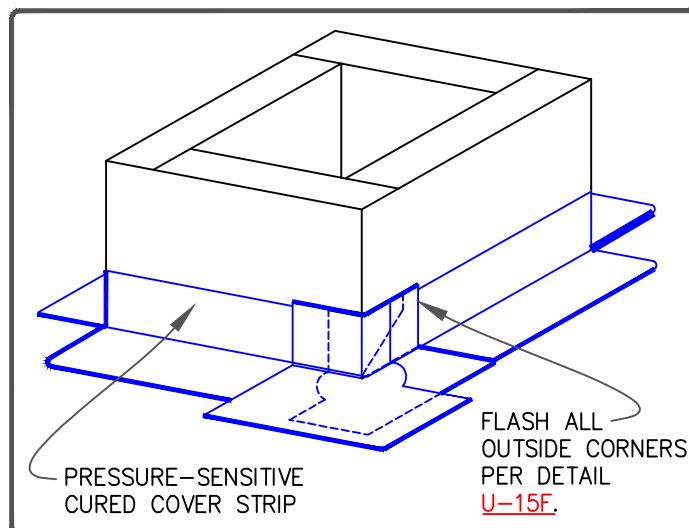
DETAIL NOT FOR USE ON 25 AND 30-YEAR WARRANTY PROJECTS. ACCEPTABLE FLASHING SHALL CONFORM TO [DETAILS U-5A OR U-5B](#).
